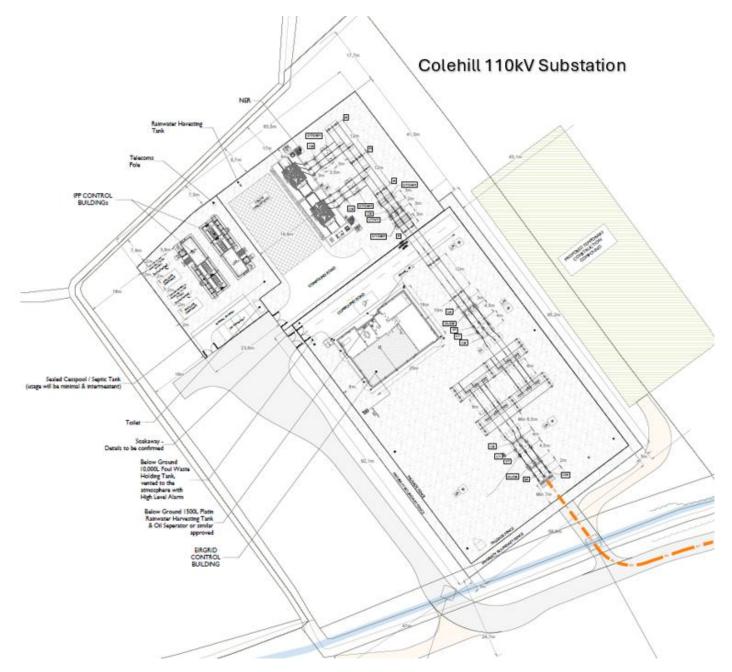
Future Colehill Solar Farm 110kV Substation Layout Plan
